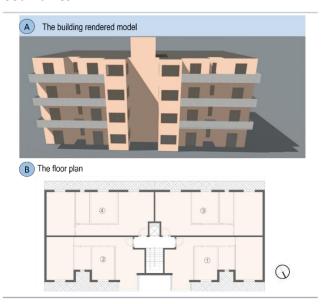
(a) rendered view of the building model, (b) floor plan of the building
